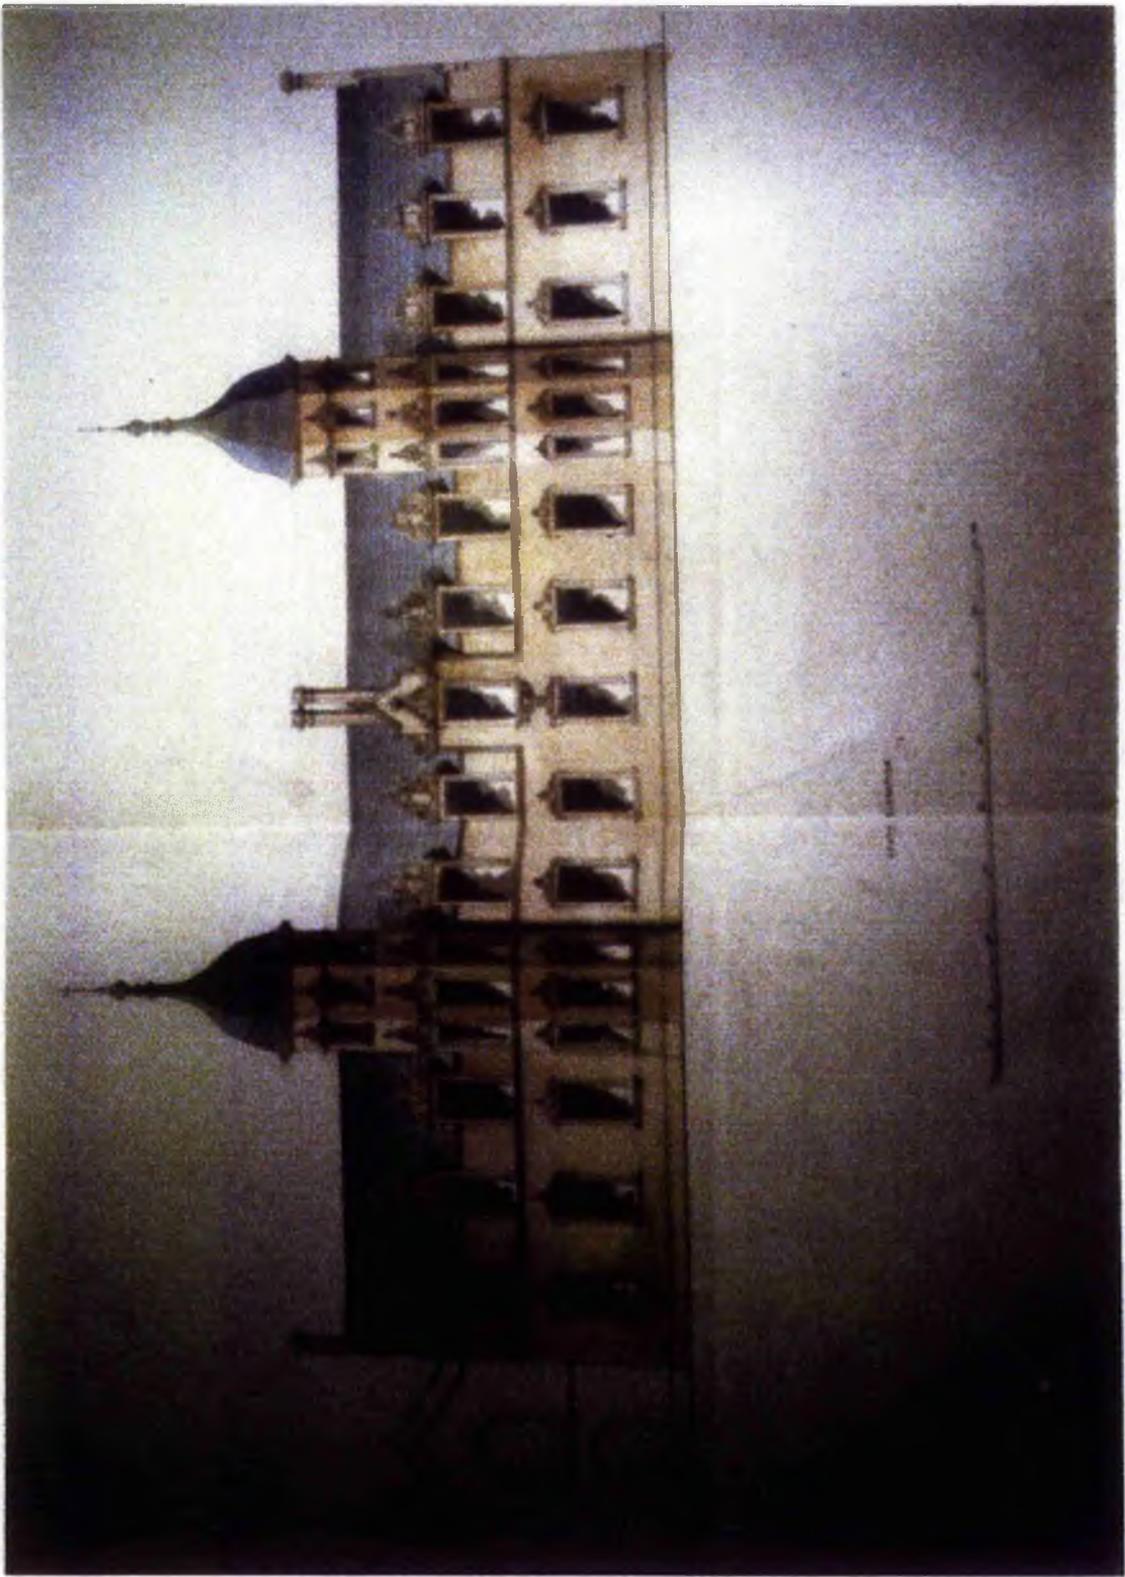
King's College. Neo Jacobean south elevation replacing Dr Fraser's building. R. Matheson, 1855.
